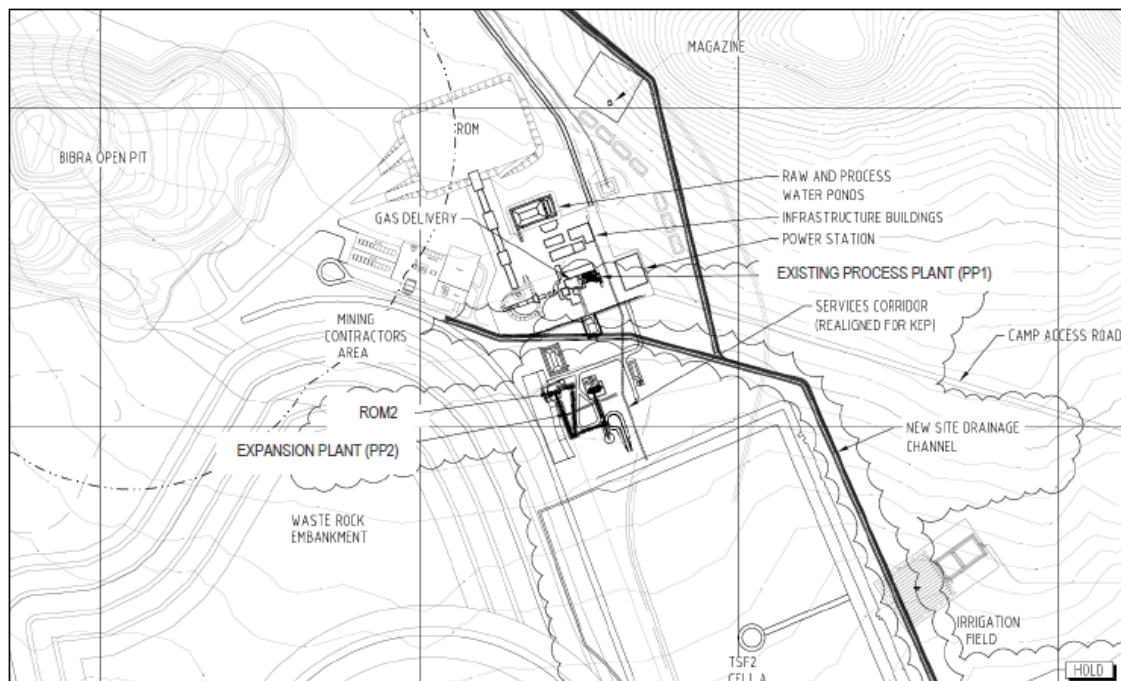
Existing and proposed processing plants at the Premises (Source, Capricorn Metals, 2025)
